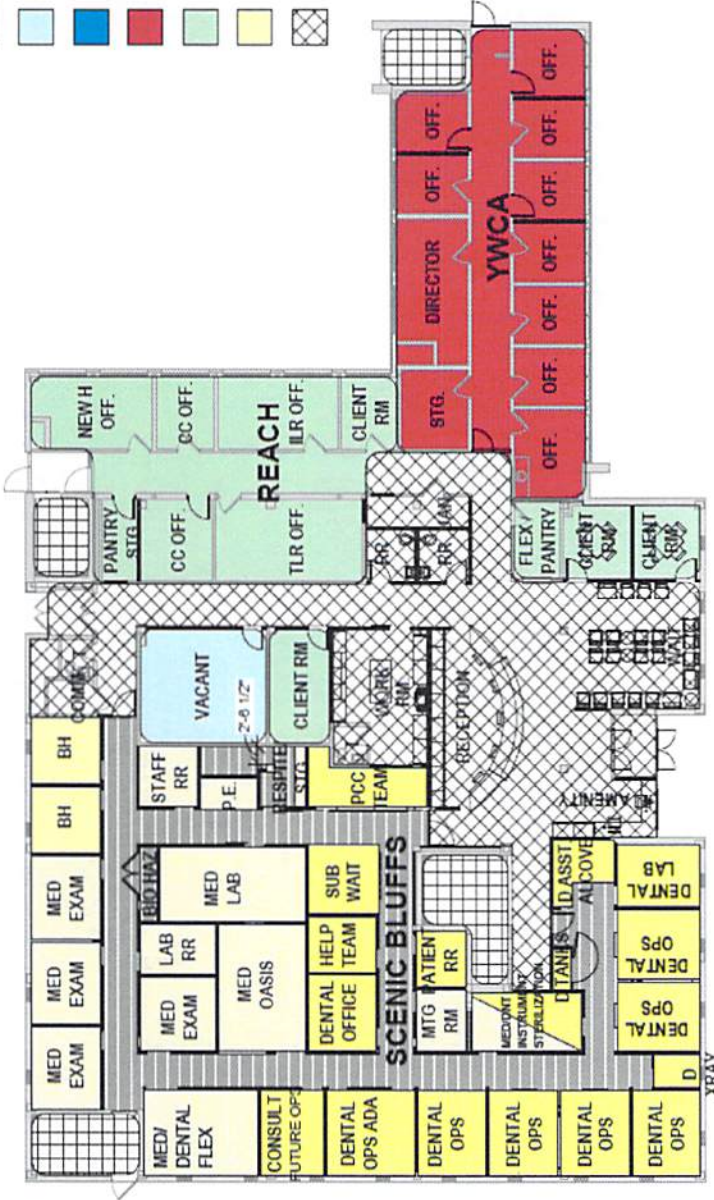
EXHIBIT D: DRAFT INTERIOR DESIGN PLANS – LOBBY AREA AND CLIENT SERVICE ROOMS
